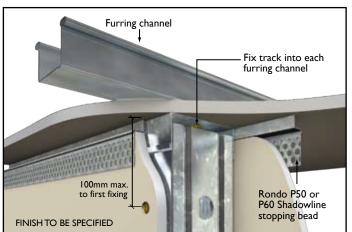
A:Wall/Ceiling intersection detail with friction fit for Shadowline applications
